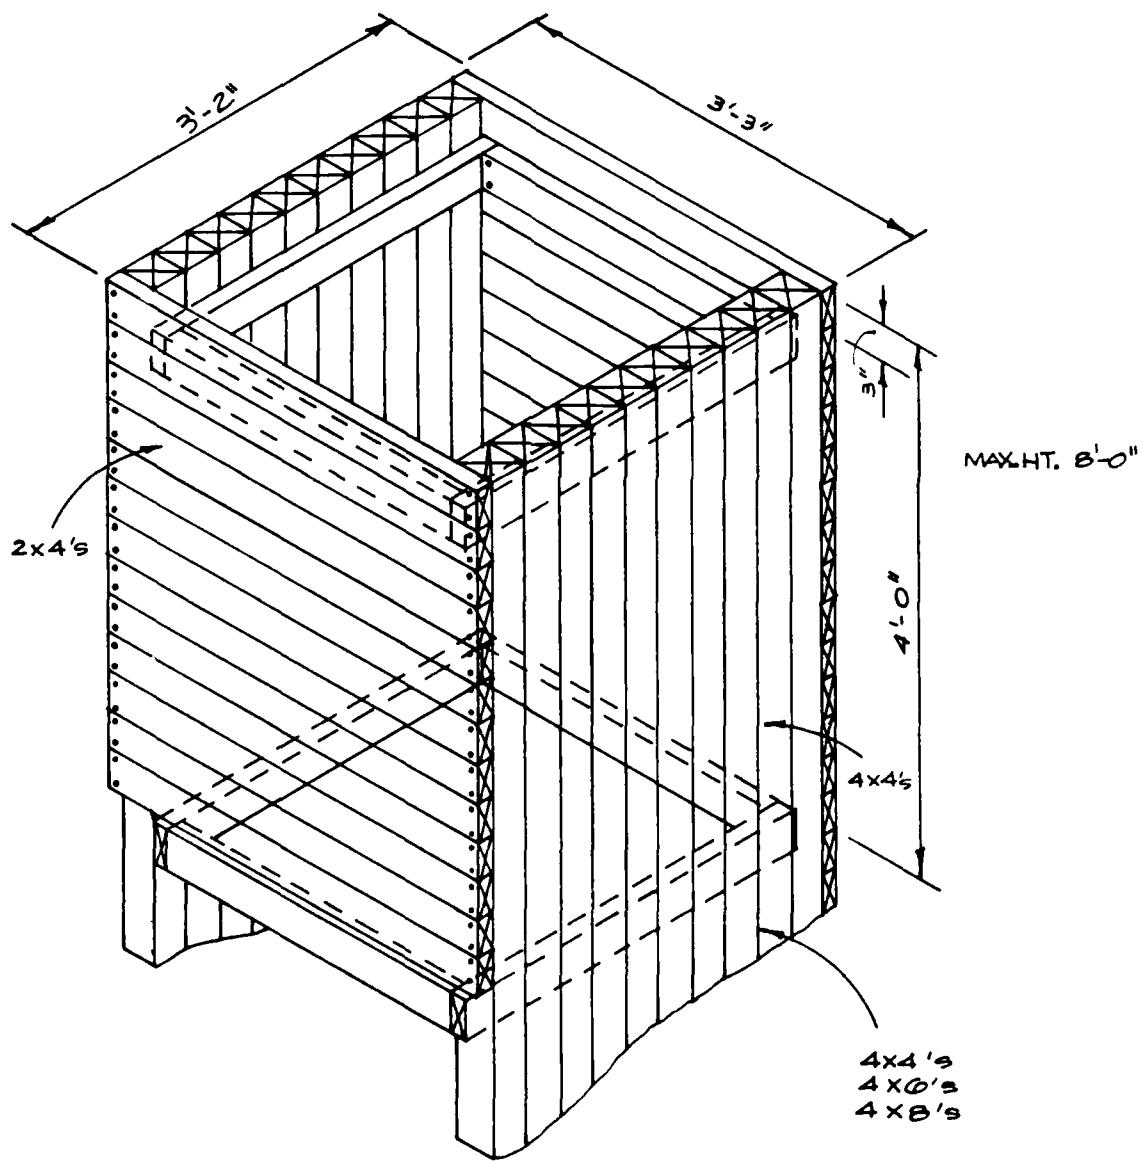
40 psi Entrance Structure to Key Worker Shelter (Wood Construction).
